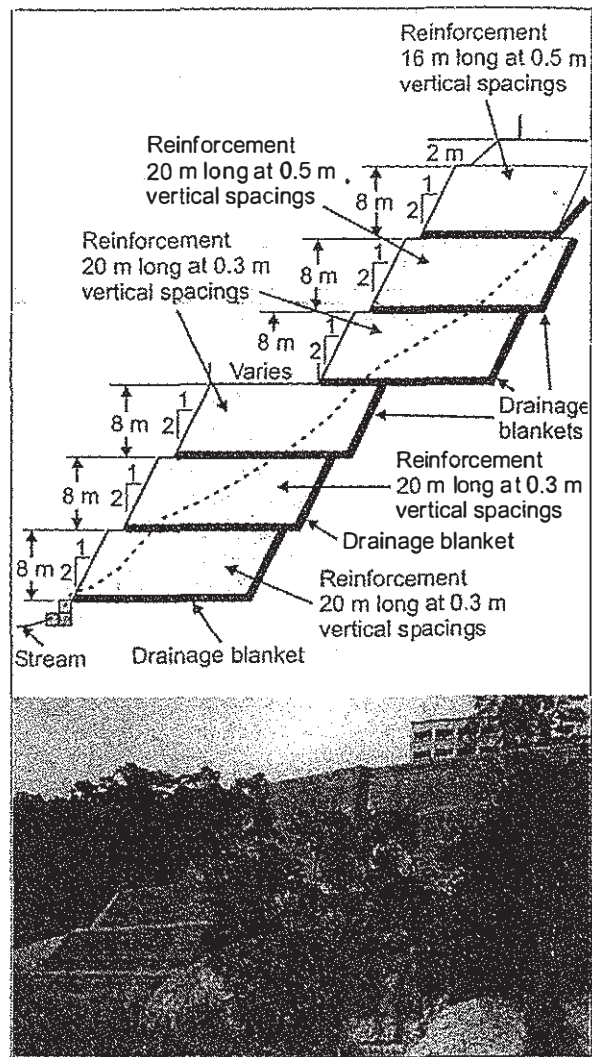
Reinforced fill slope, Nan-Hua, Taiwan.
